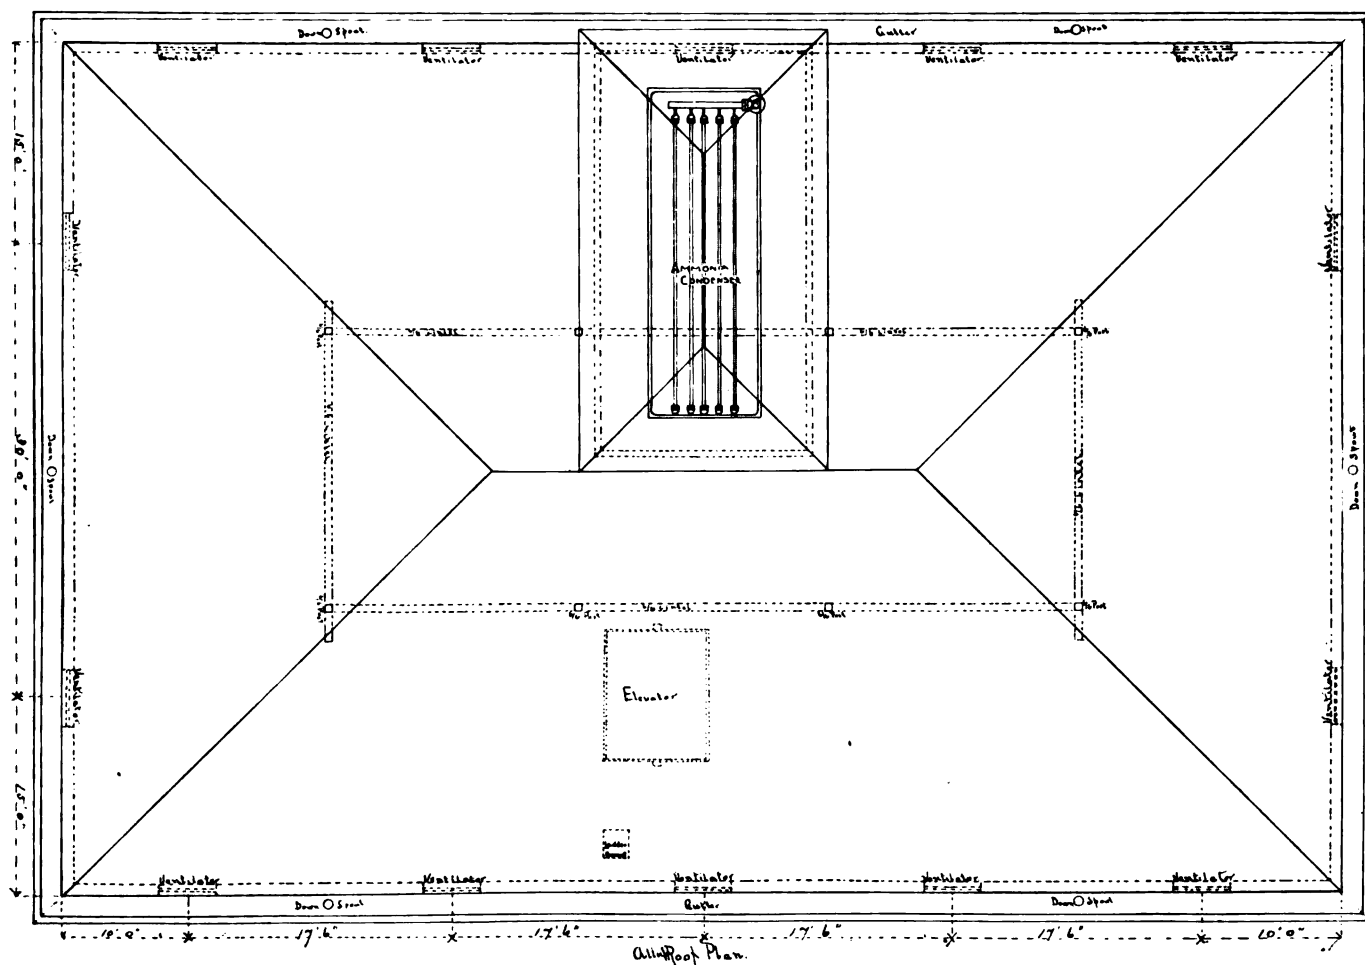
ATTIC AND ROOF PLAN, TOLEDO COLD STORAGE CO.'S NEW WAREHOUSE, TOLEDO, OHIO.
